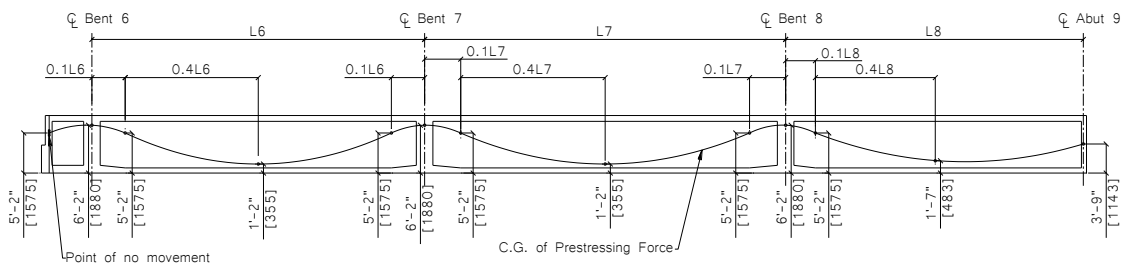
Prestressing tendons profile in Frame 2, Bridge 4
